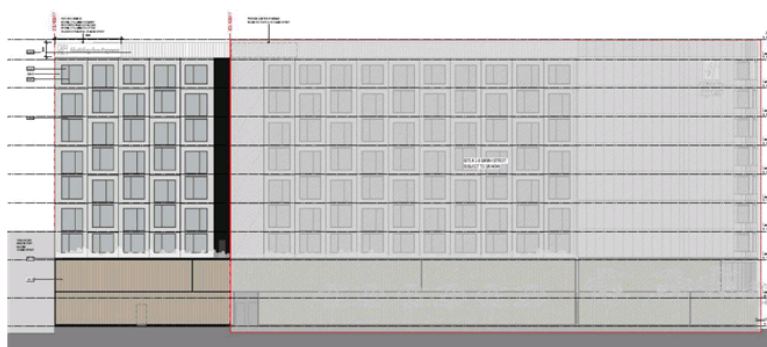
Proposed Southern Elevation (showing 2-8 Sarah Street hatched in grey)
